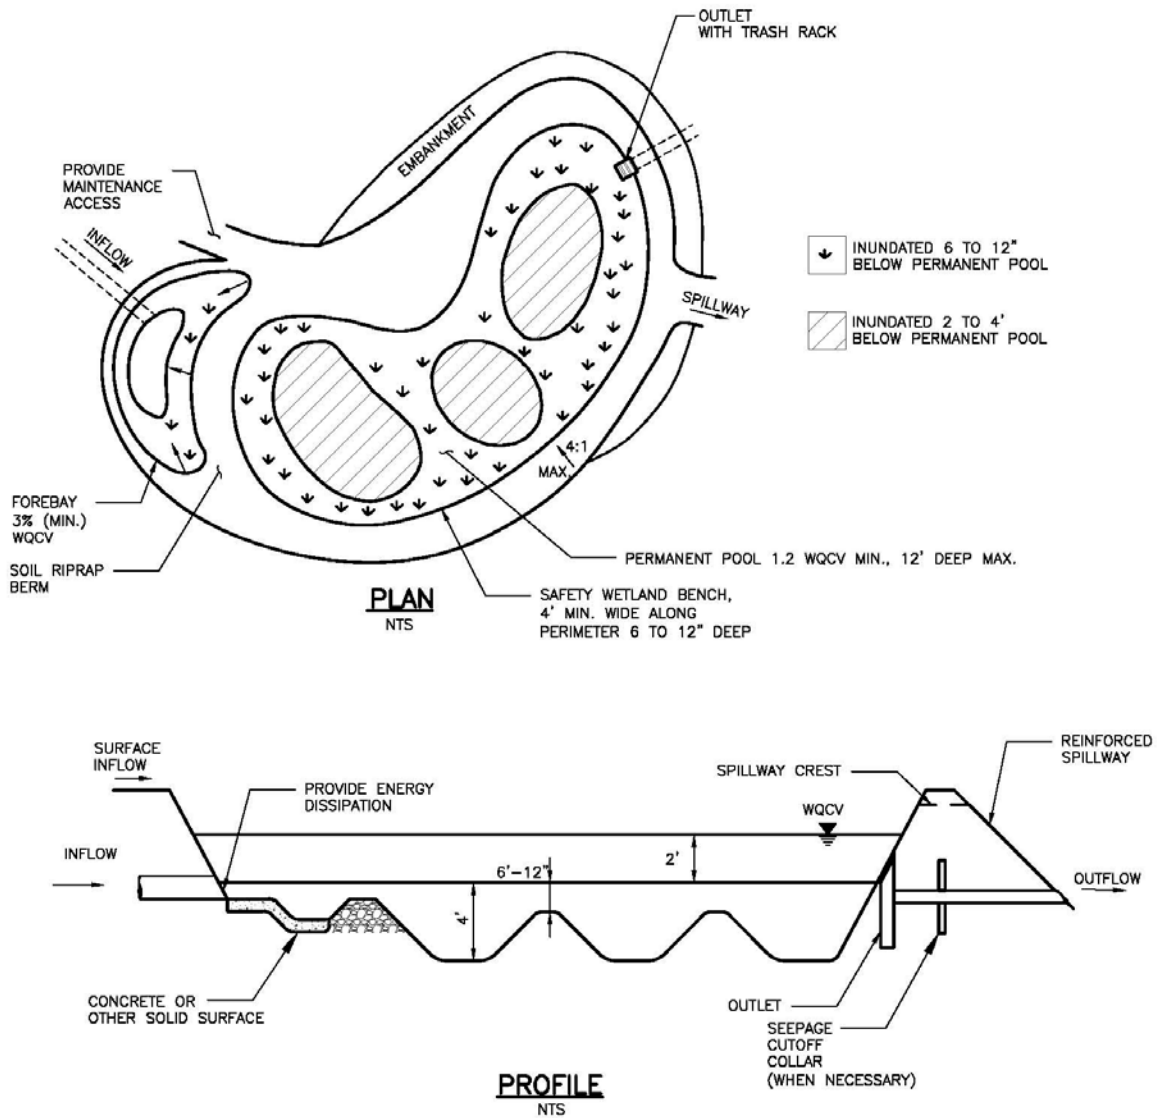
Constructed Wetland Pond – Plan and Cross-Section
